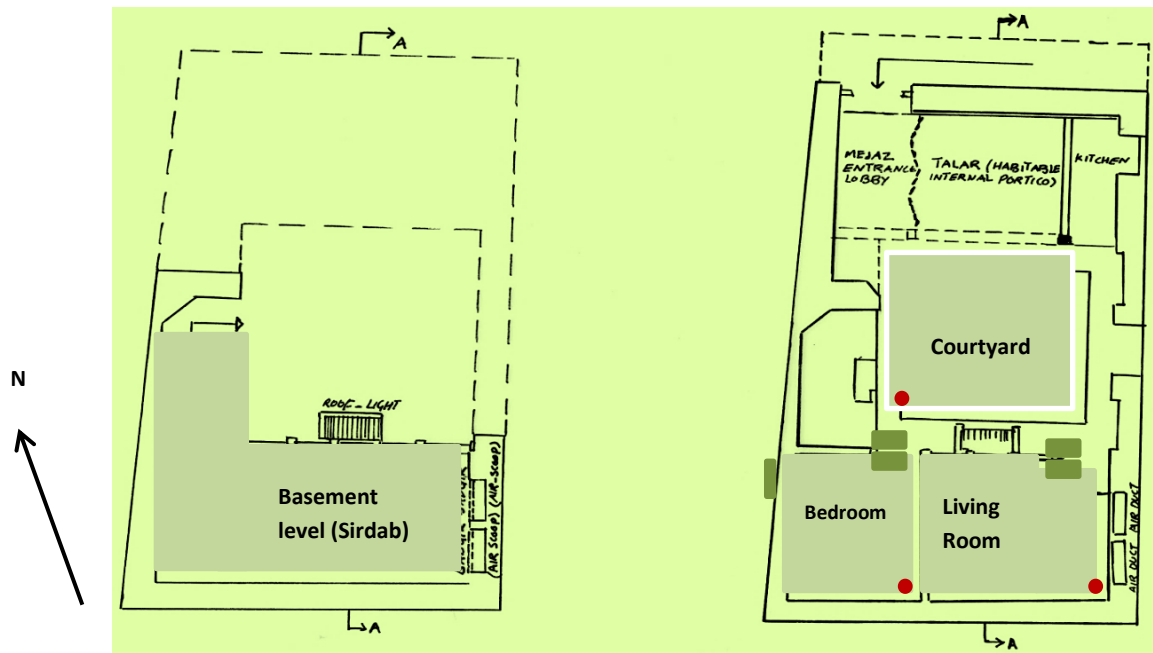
Basement level plan and ground floor level plan (Researcher) Scale: 1:50
